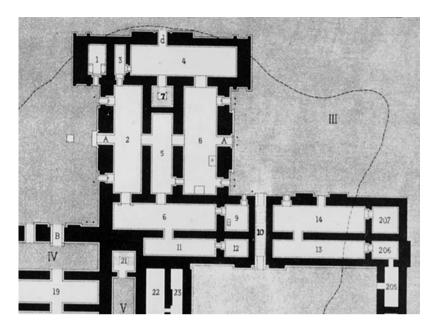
Detail, Plan of Reception/residential complex, Royal Palace, Khorsabad.
